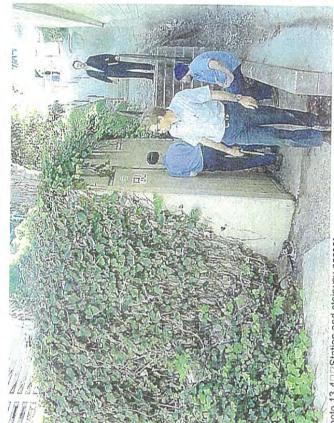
III Station and stainway access 12/18/2002 (Wed), 11:17 AM
